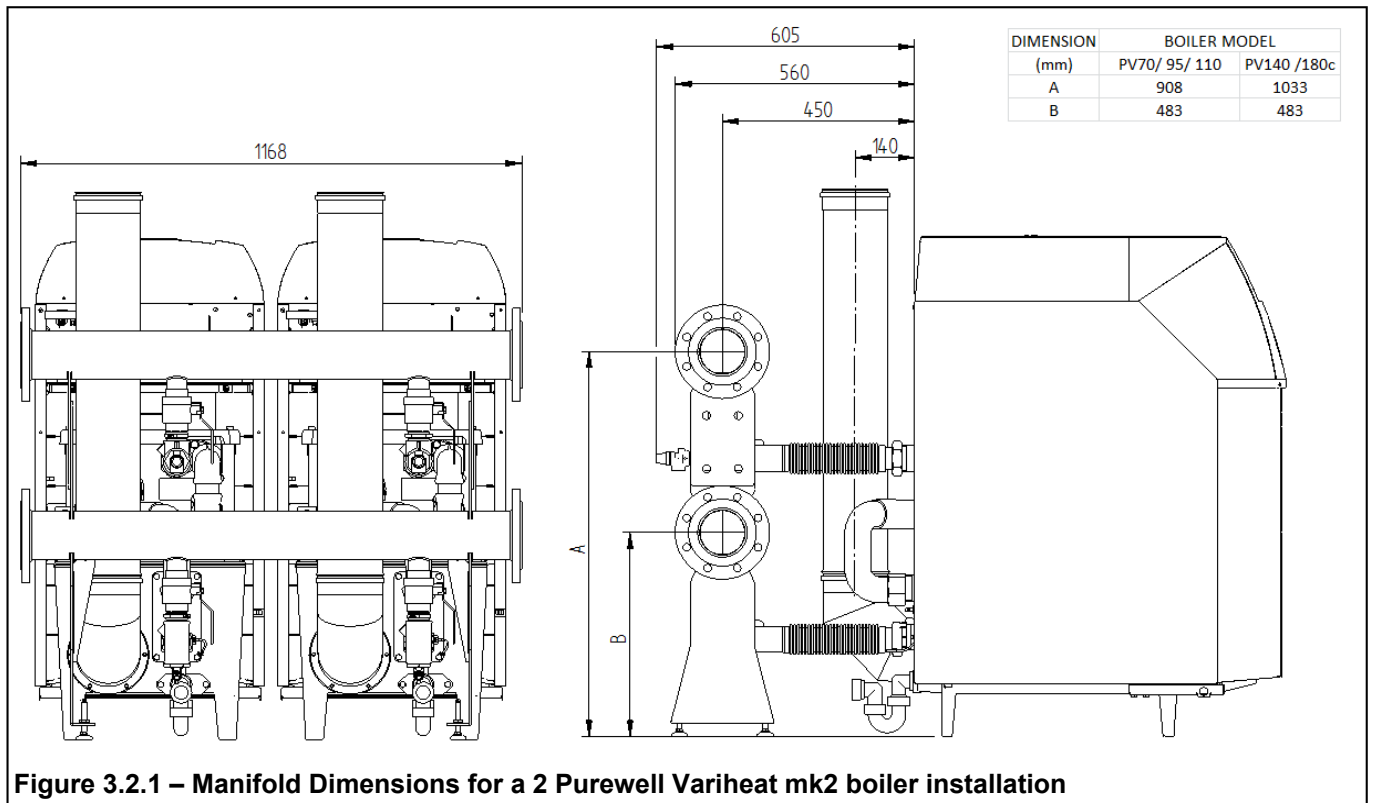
Manifold Dimensions for a 2 Purewell Variheat mk2 boiler installation
